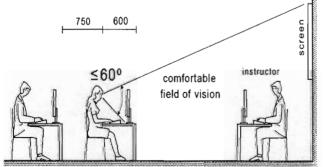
Section through CAD teaching room (Drawn from Neufert, 2000;351)
